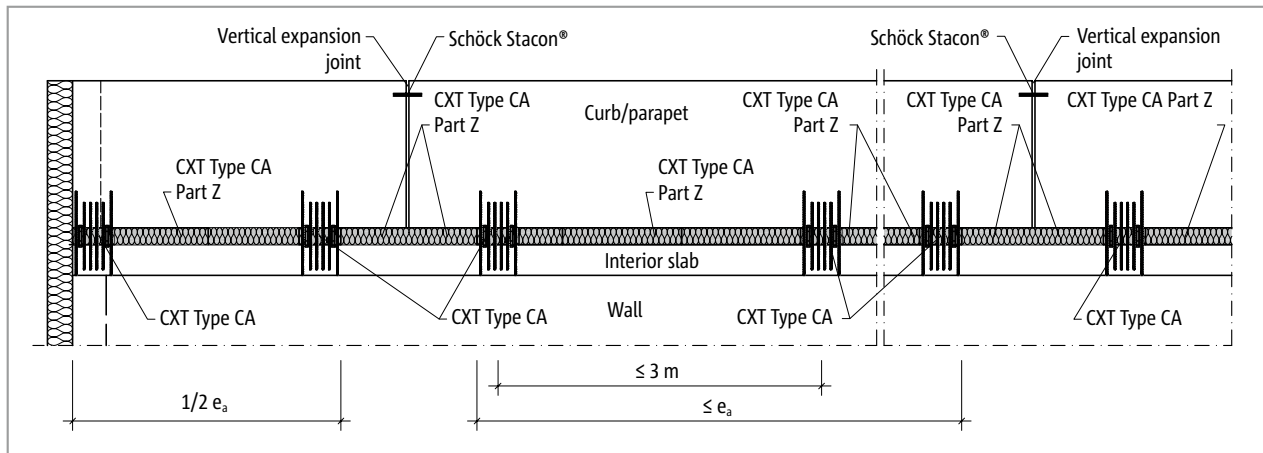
Schöck Isokorb® CXT Type CA: Vertical expansion joint arrangement
